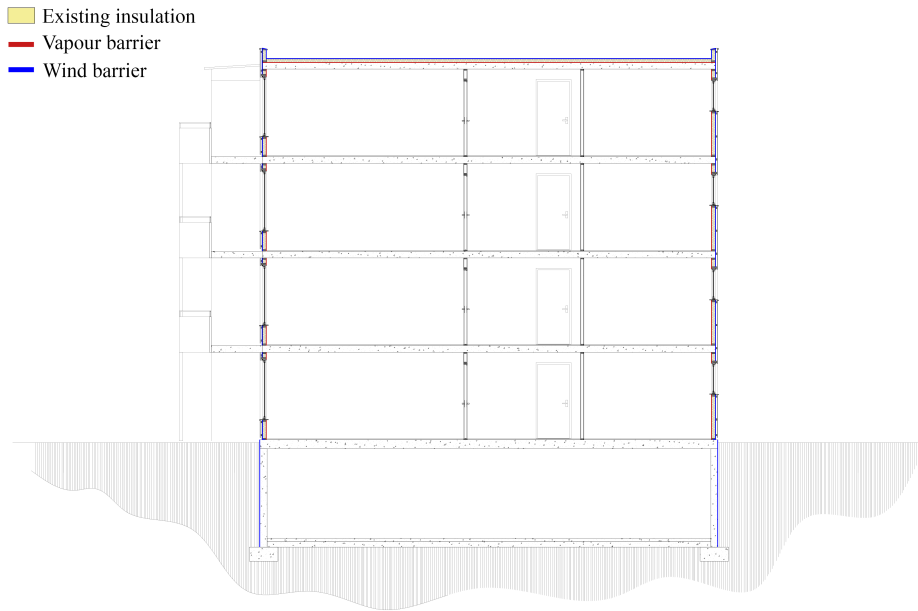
Section of a typical apartment block with the insulation layer, wind barrier and vapour barrier marked.
